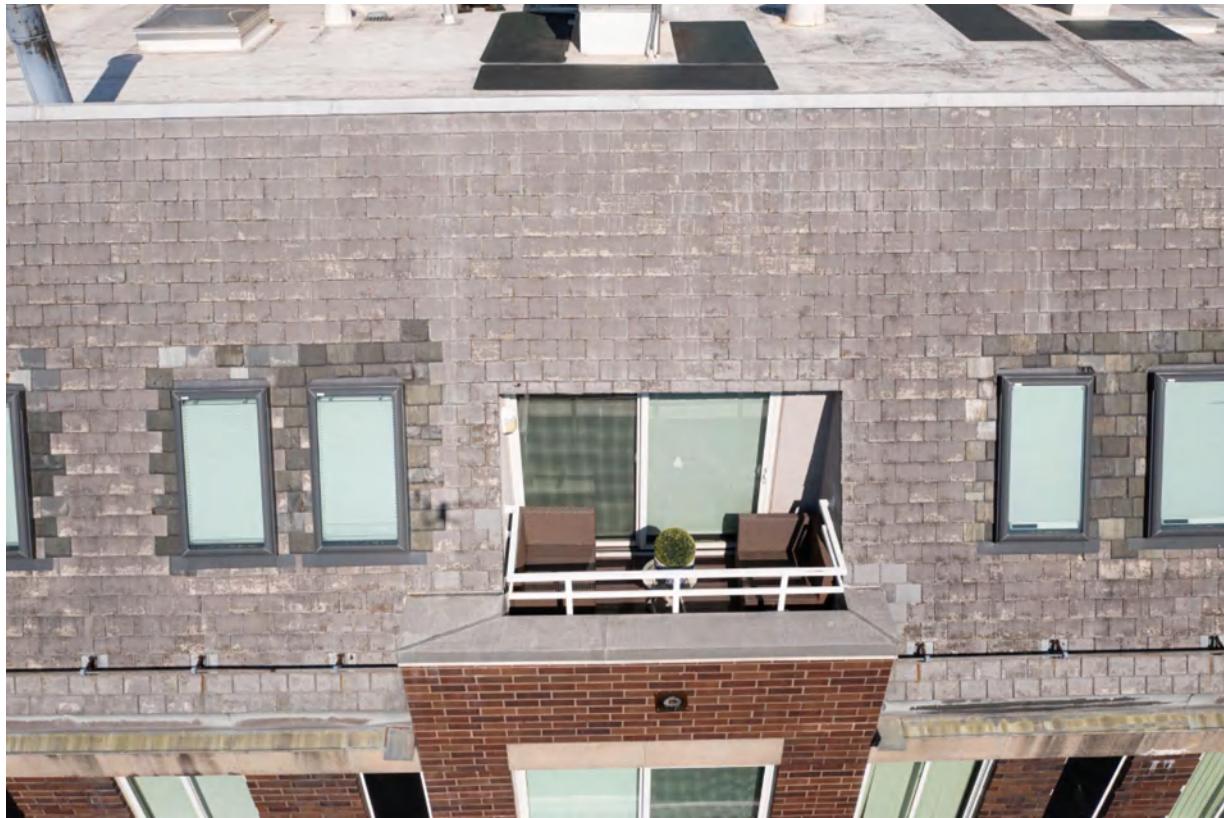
replaced shingles (with what appeared to be natural slate shingles) at localized locations around skylights
